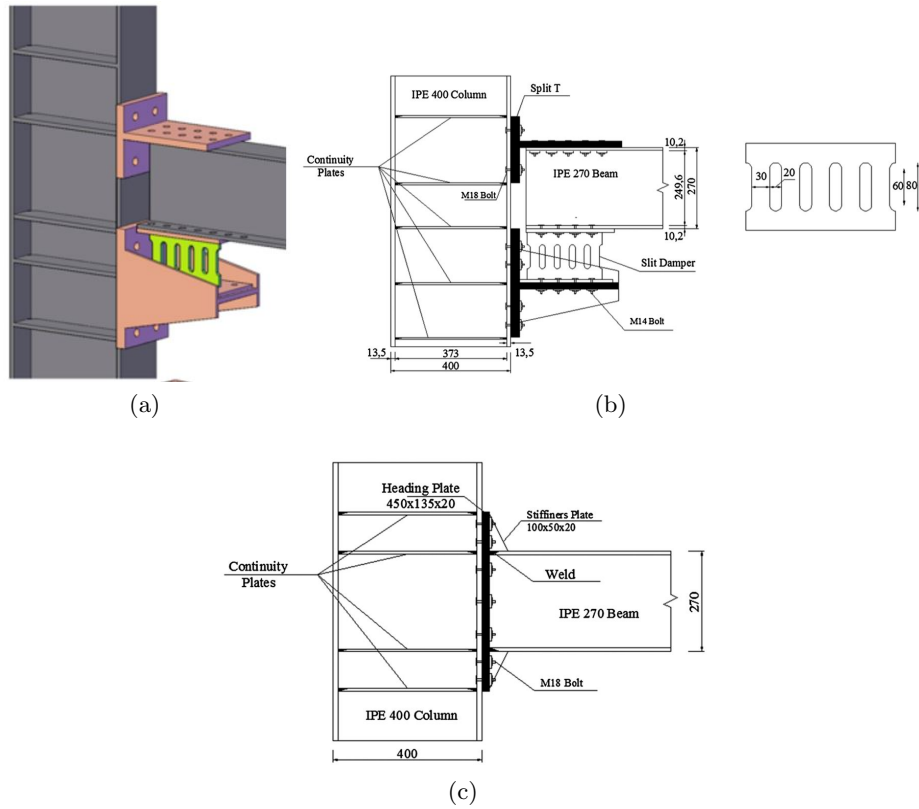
(a) typical schematic of the slit damper tested and (b) connection details fitted with the damper (c) traditional extended end plate connection (Köken and Körolu, 2015)
